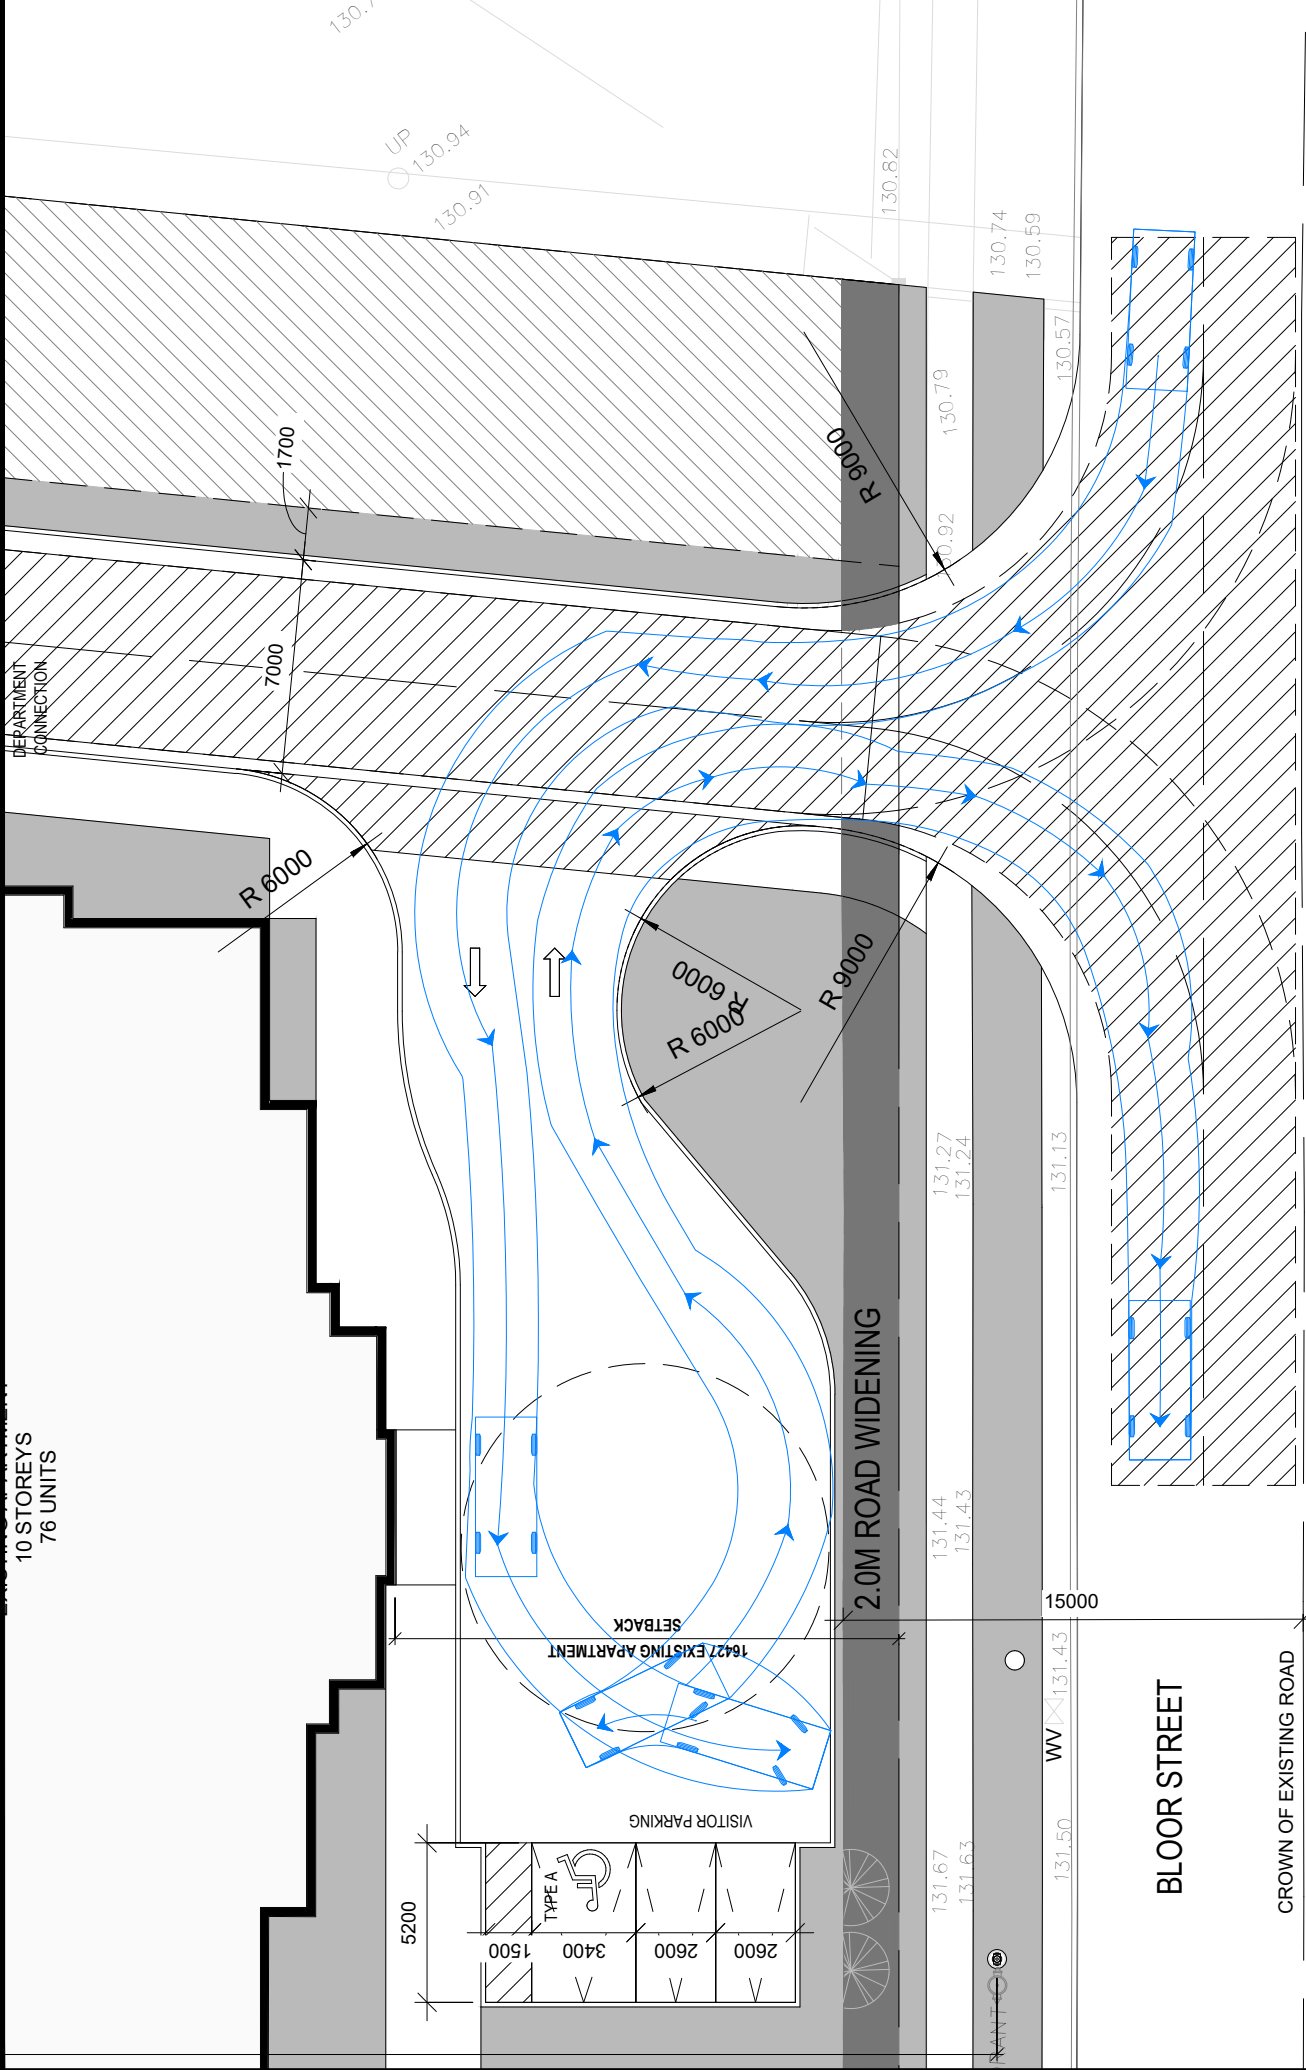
Loading Vehicle (HSU) Leaving Loading Area and Exiting Site
